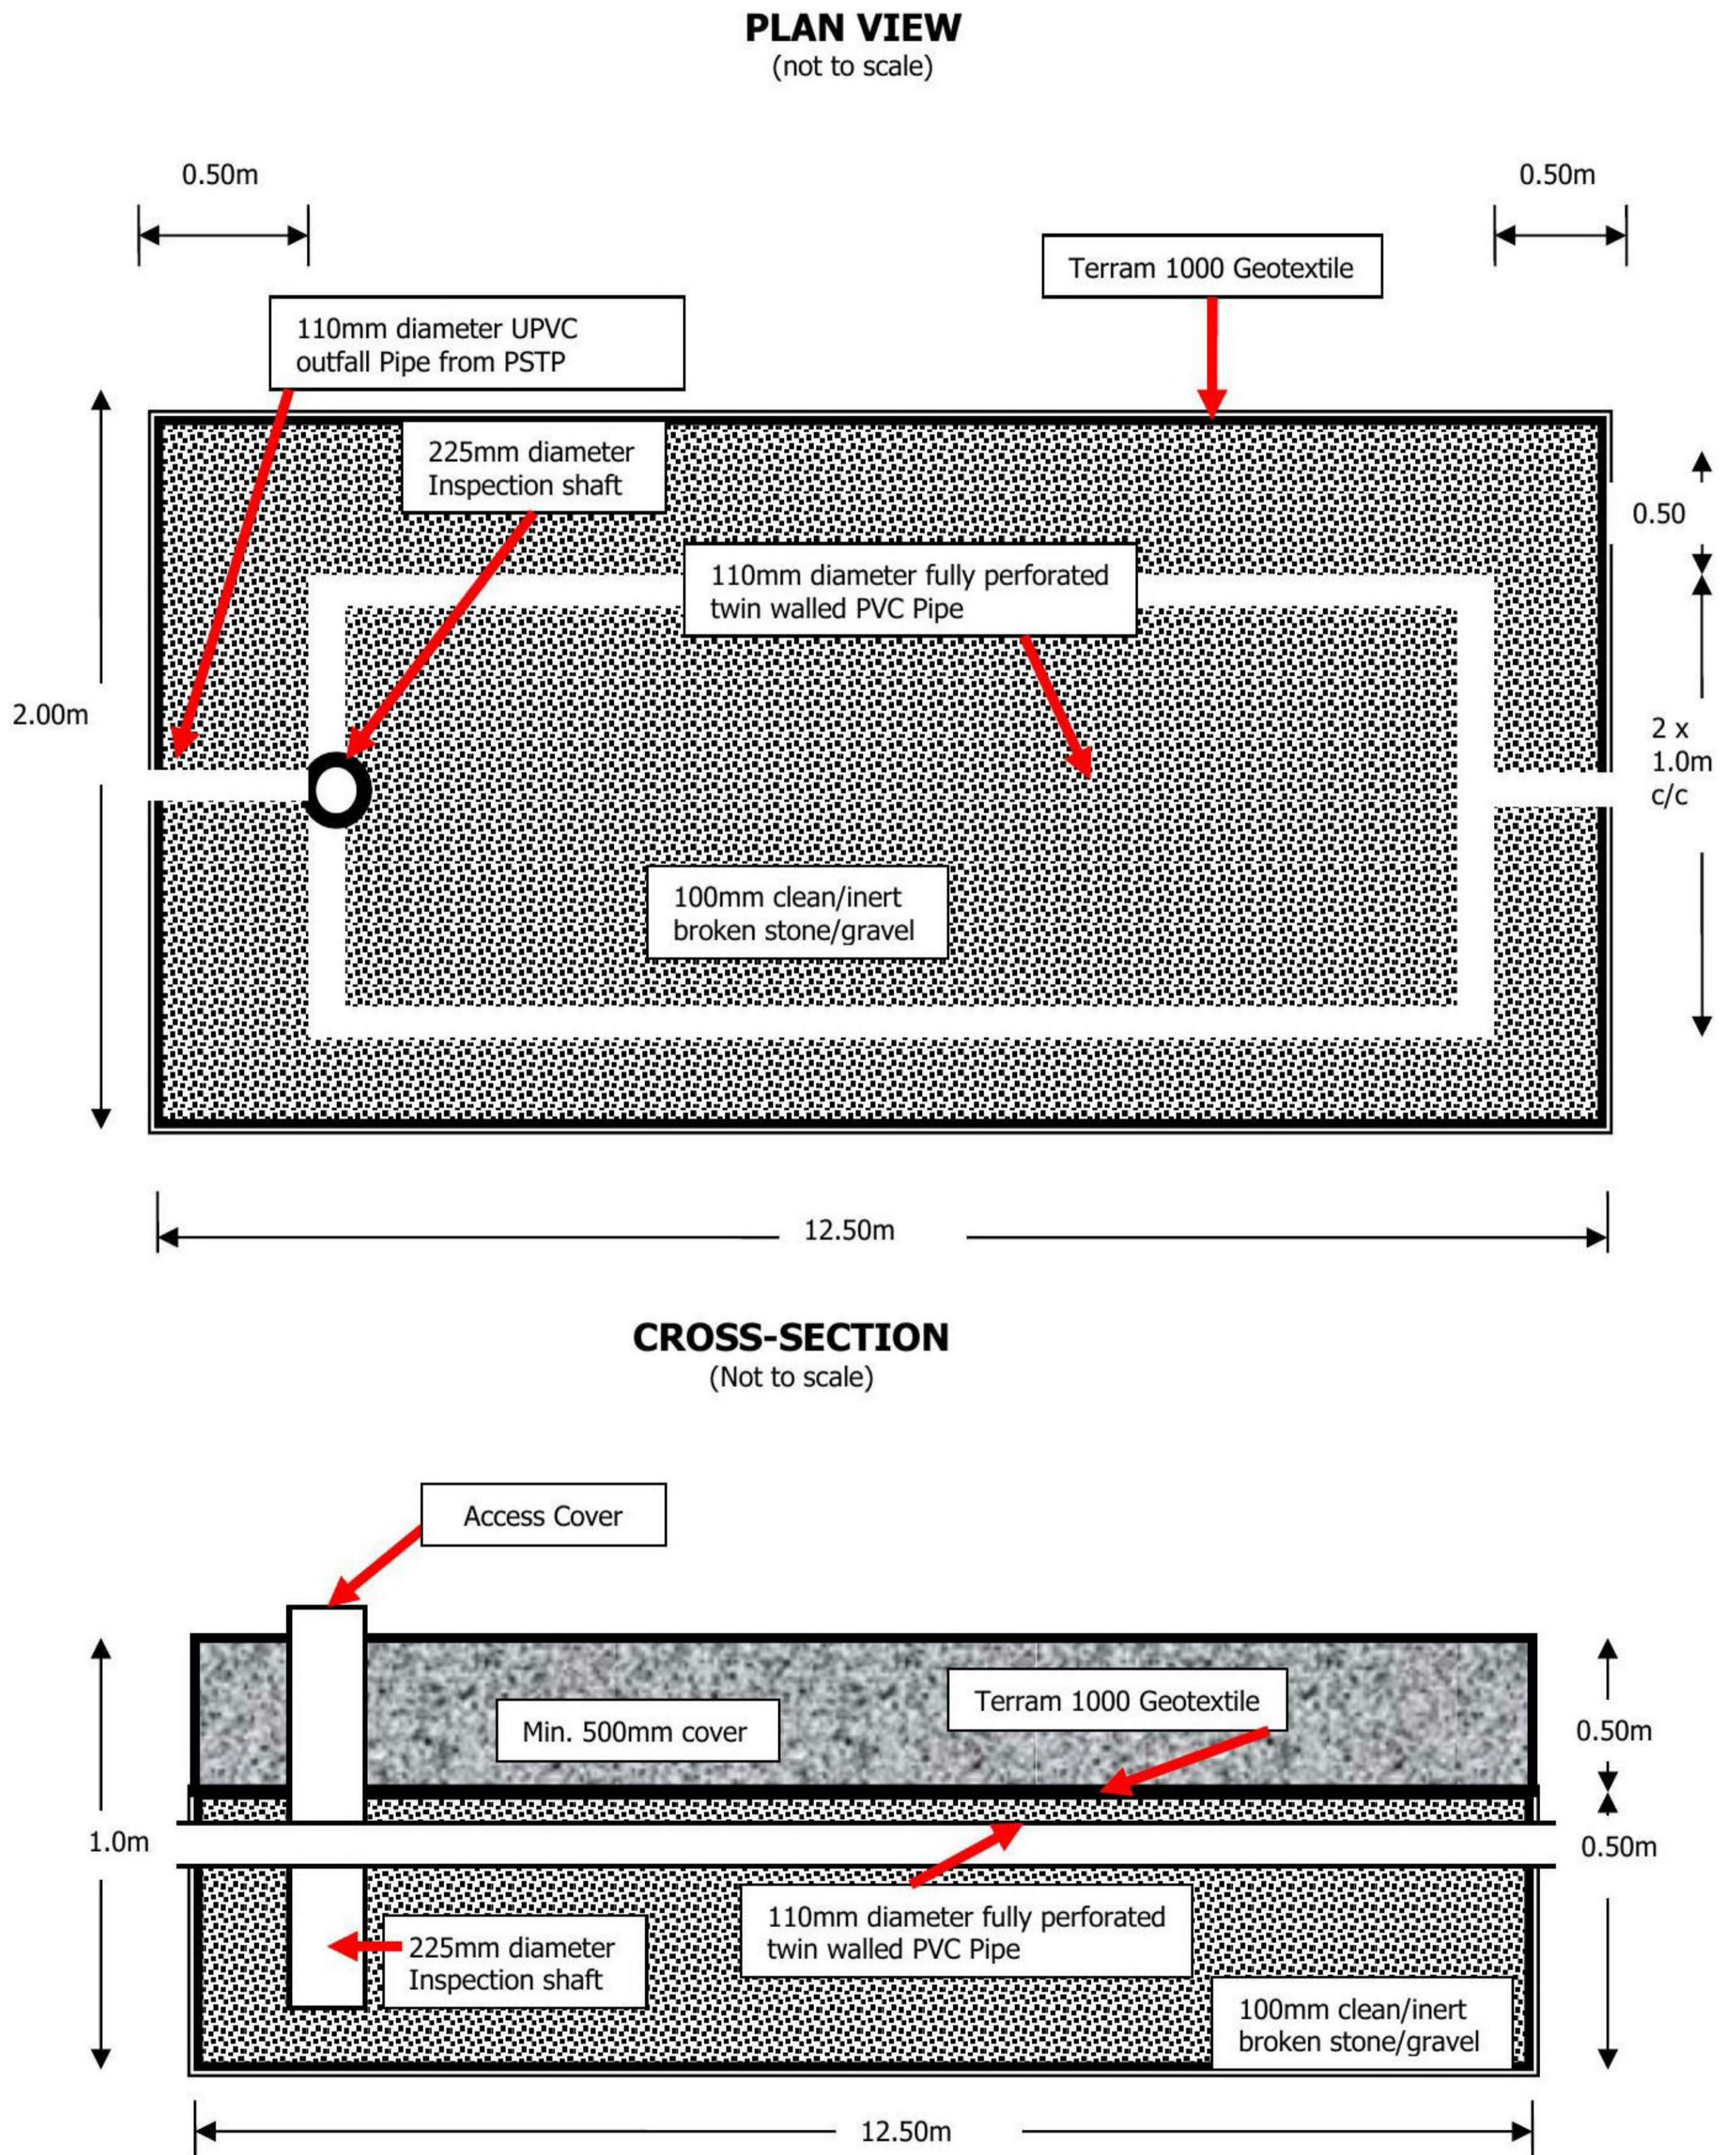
INDICATIVE SITE DRAINAGE LAYOUT
